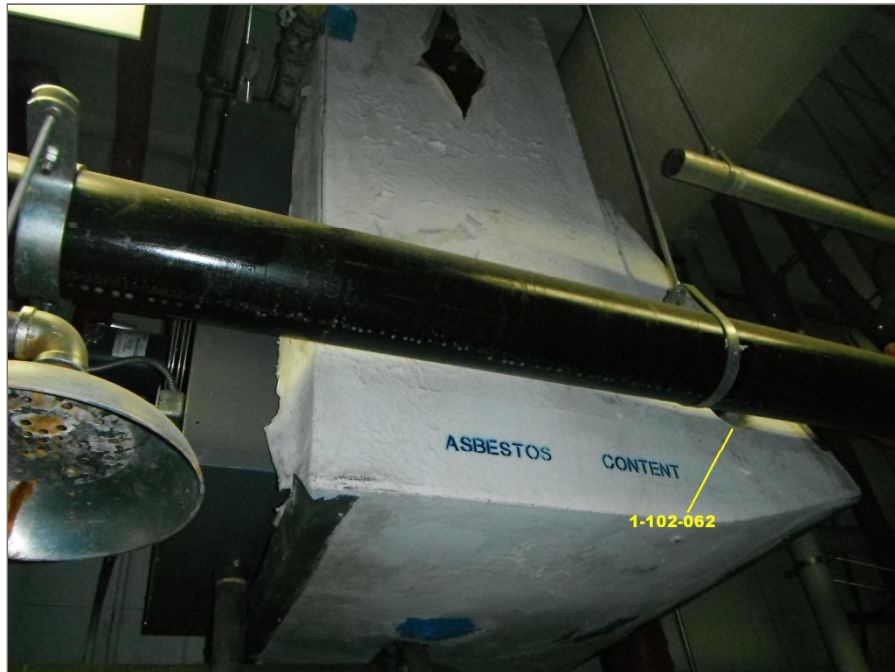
Asbestos-containing mudded insulation applied to the air handling unit located at the west end of the boiler room. Tetra Tech sample 1-102-062.
